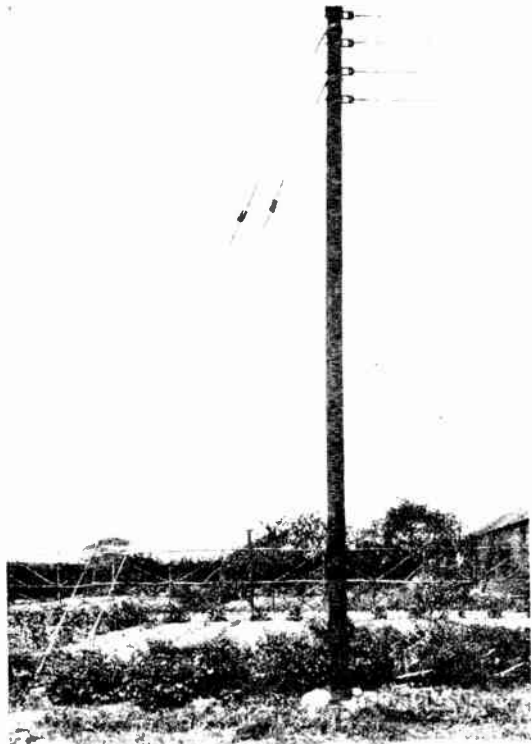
TERMINAL POLE ON L.T. LINE.
